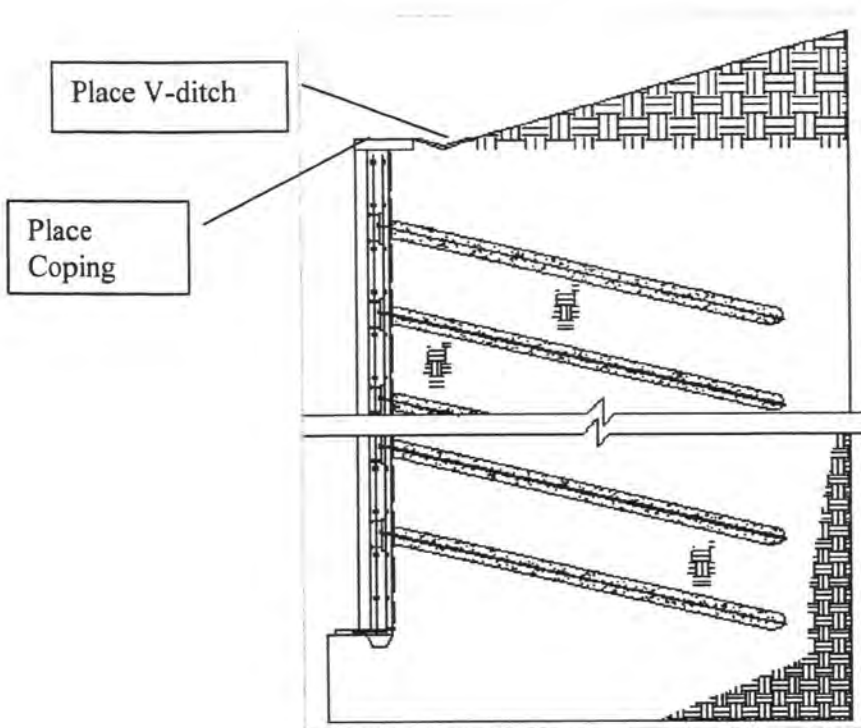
Picture showing step 12 of the construction process of Soil Nail wall
